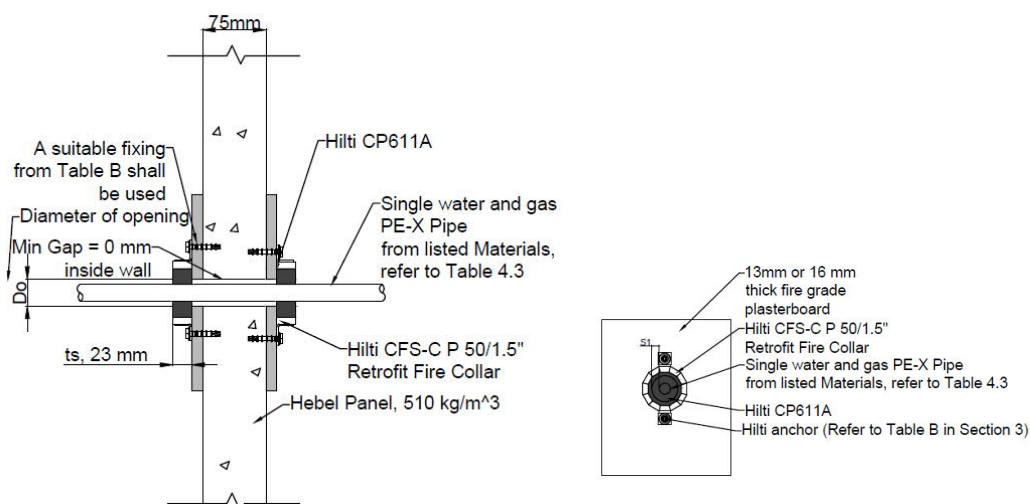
Side view- Water and gas PE-X pipe with PEF backing rod.
